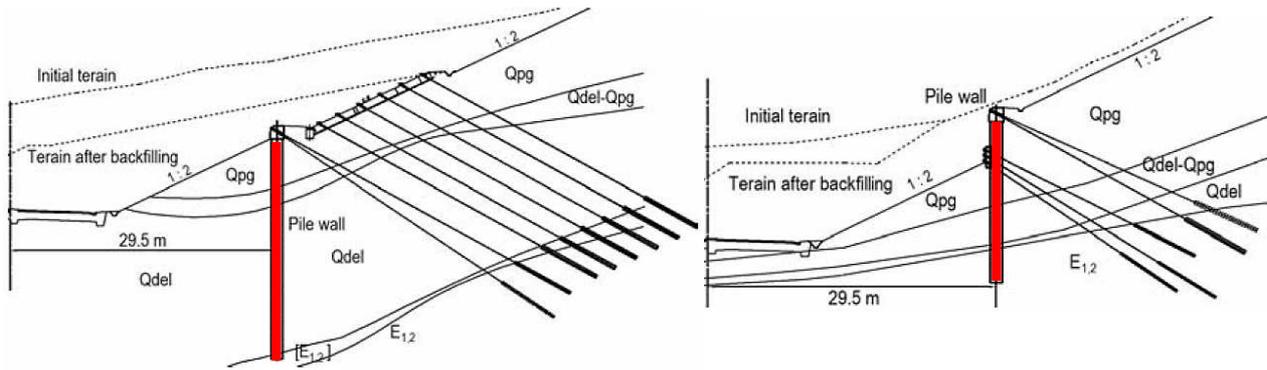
Rebernice Landslide. Typical cross section P 257 (left) and P 261 (right) for rehabilitated situation: anchored bored pile wall linked by cap beam (left and right) and additional pre-stressed anchored reinforced concrete grid beam structure (right) (Pulko et al., 2005).
